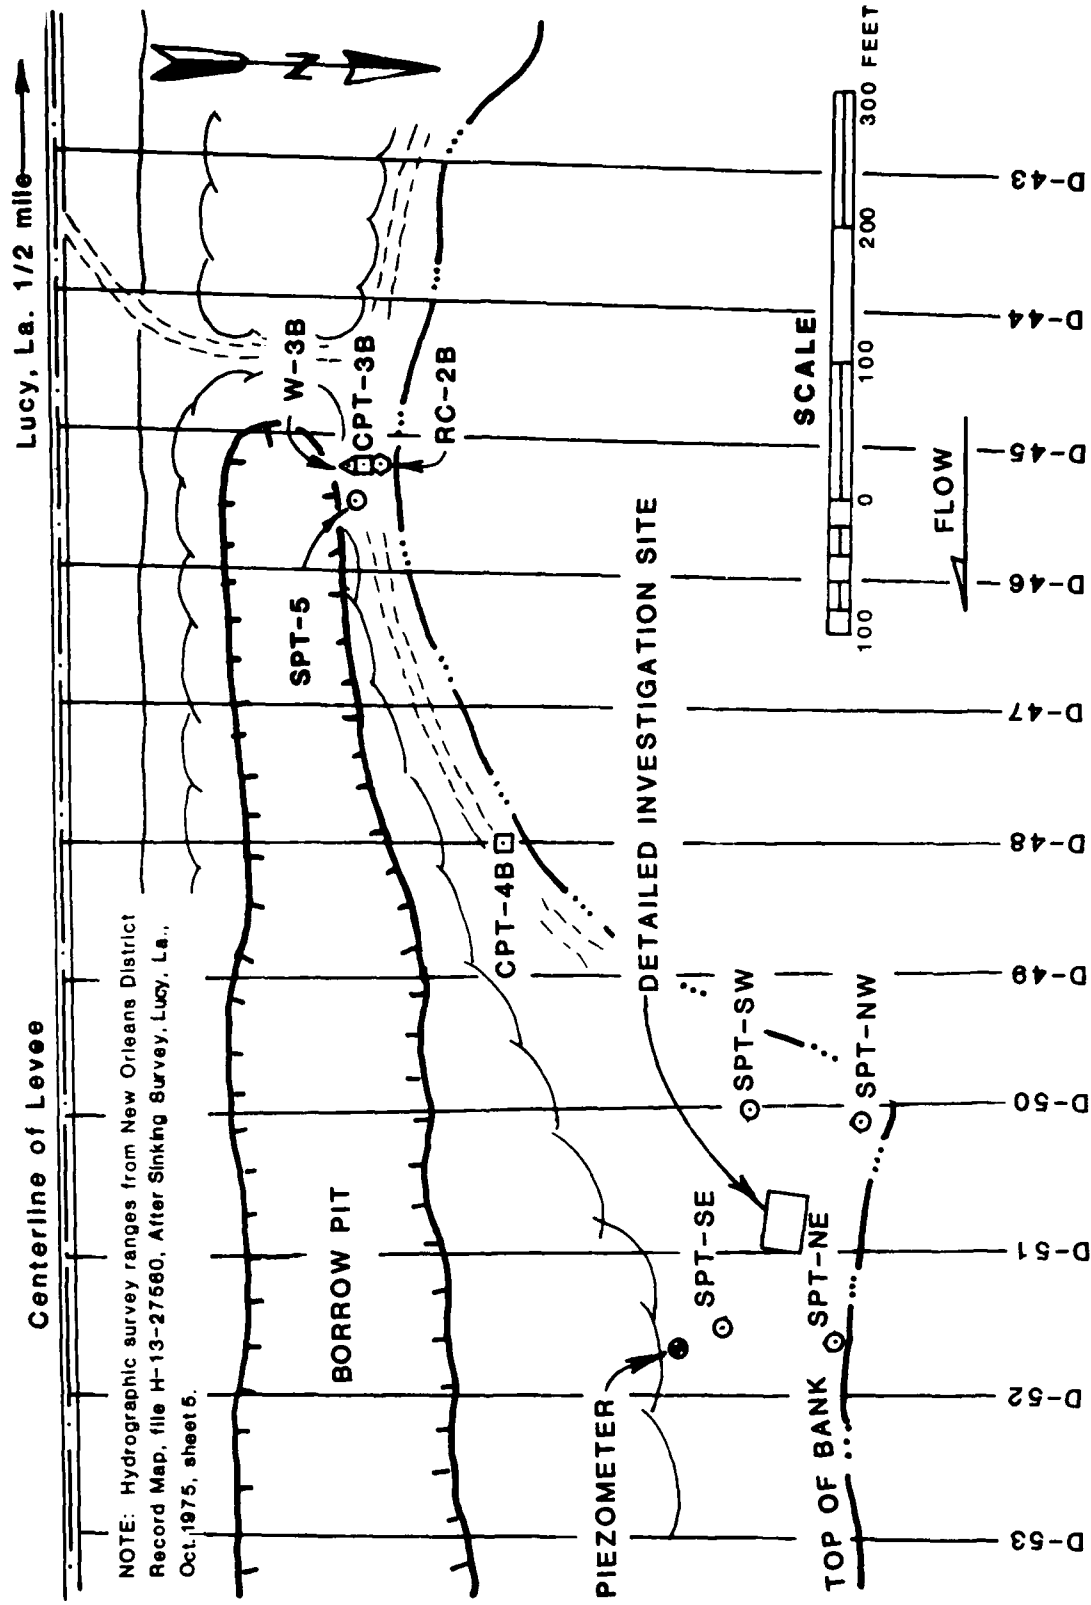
Bonnet Carre Point, locations of reconnaissance borings, detailed site and supplemental borings
